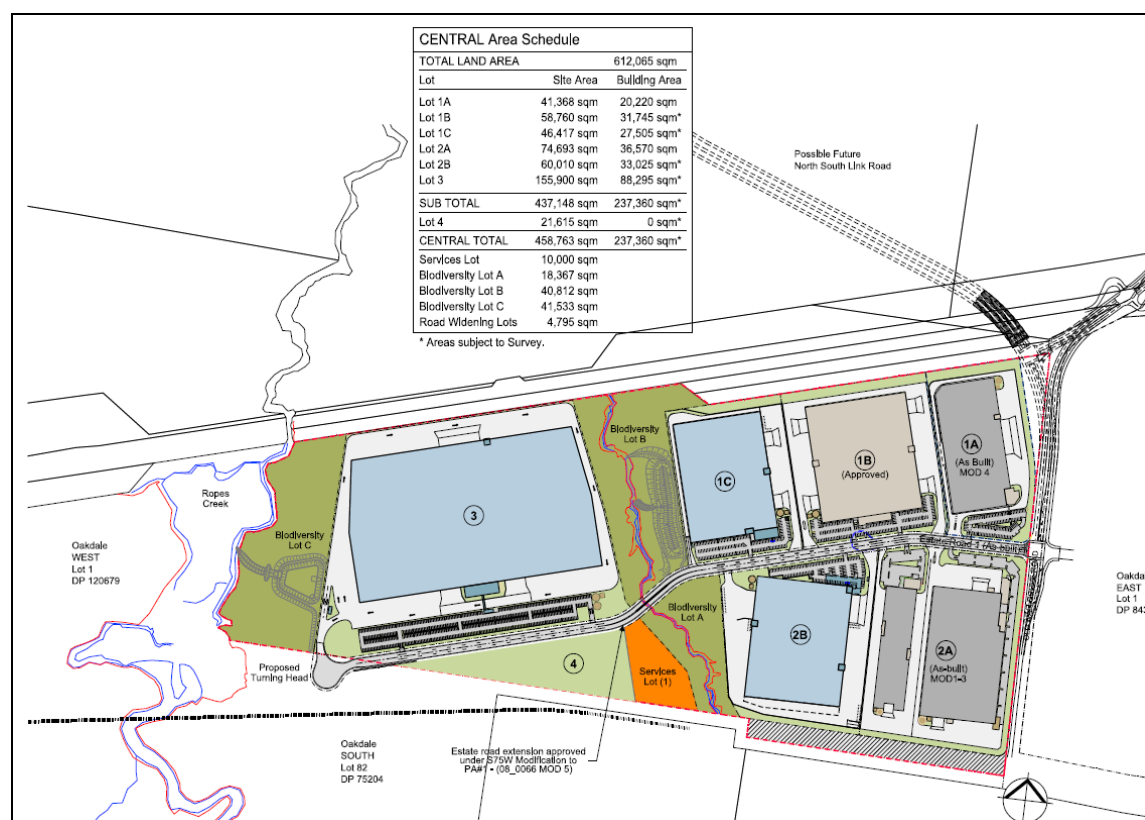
Estate Layout that incorporates built form and Concept Plan amendments (SBA, 2014)
